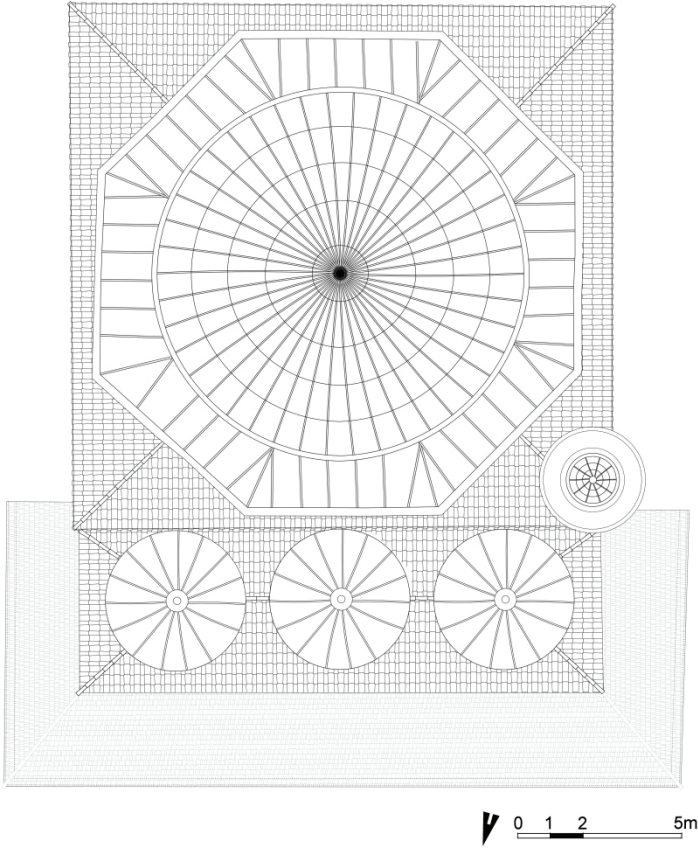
4th restitution phase, roof plan. (Dares Architecture)
